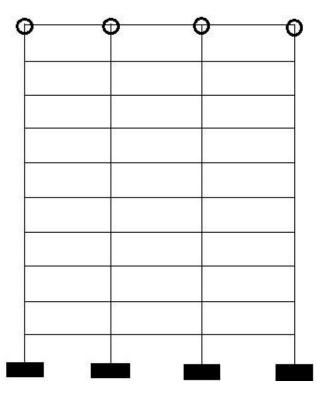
10-storey framed structure with 4 TMDs used for study
